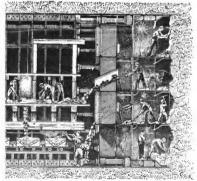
SECTIONAL VIEW OF HYDRAULIC SHIELD.
